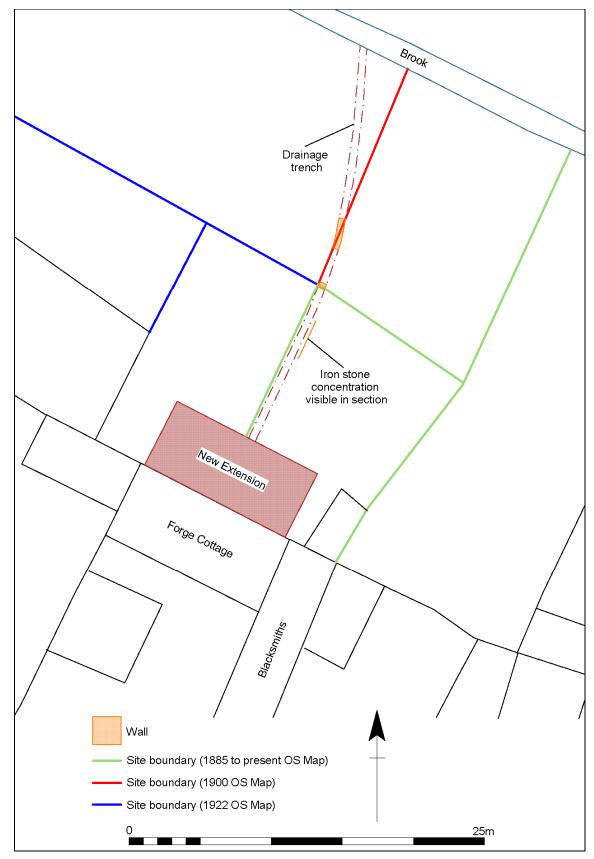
Plan of ground reduction and associated drainage trench (scale 1:250)
